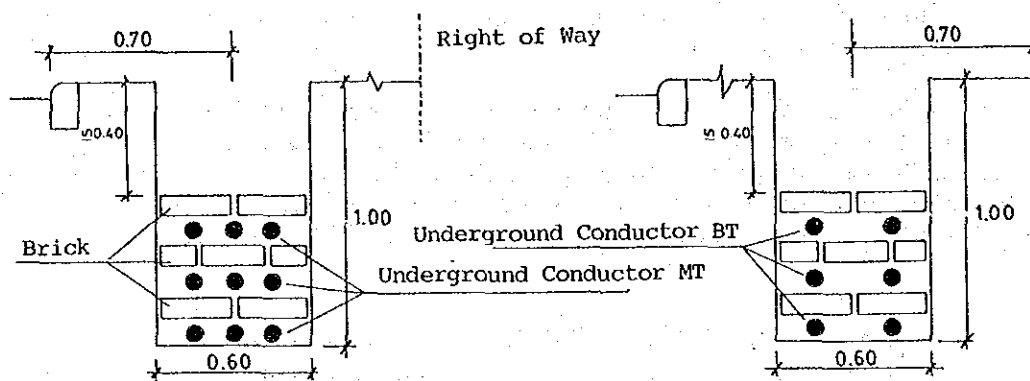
CROSS SECTION OF UNDERGROUND WIRING
